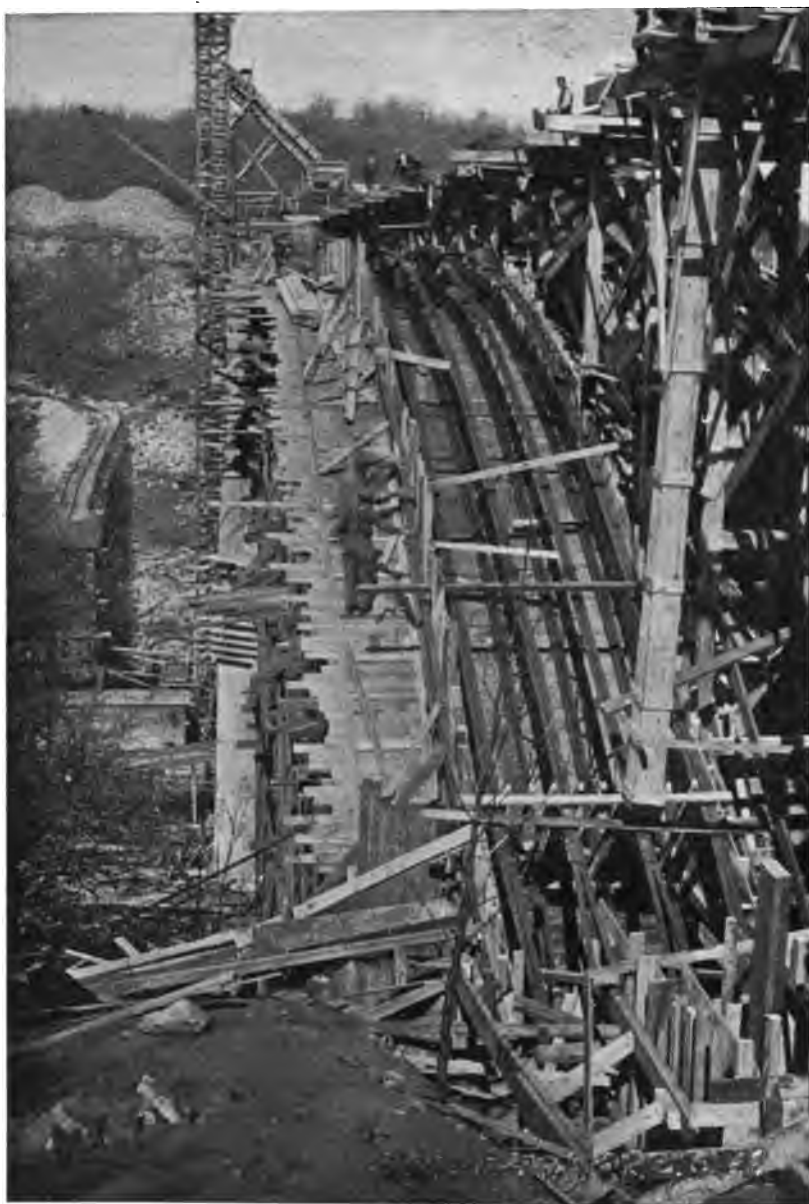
Contract 9. Rye Outlet Bridge in Construction. Tower and Steel Reinforcing Ribs in Position.
